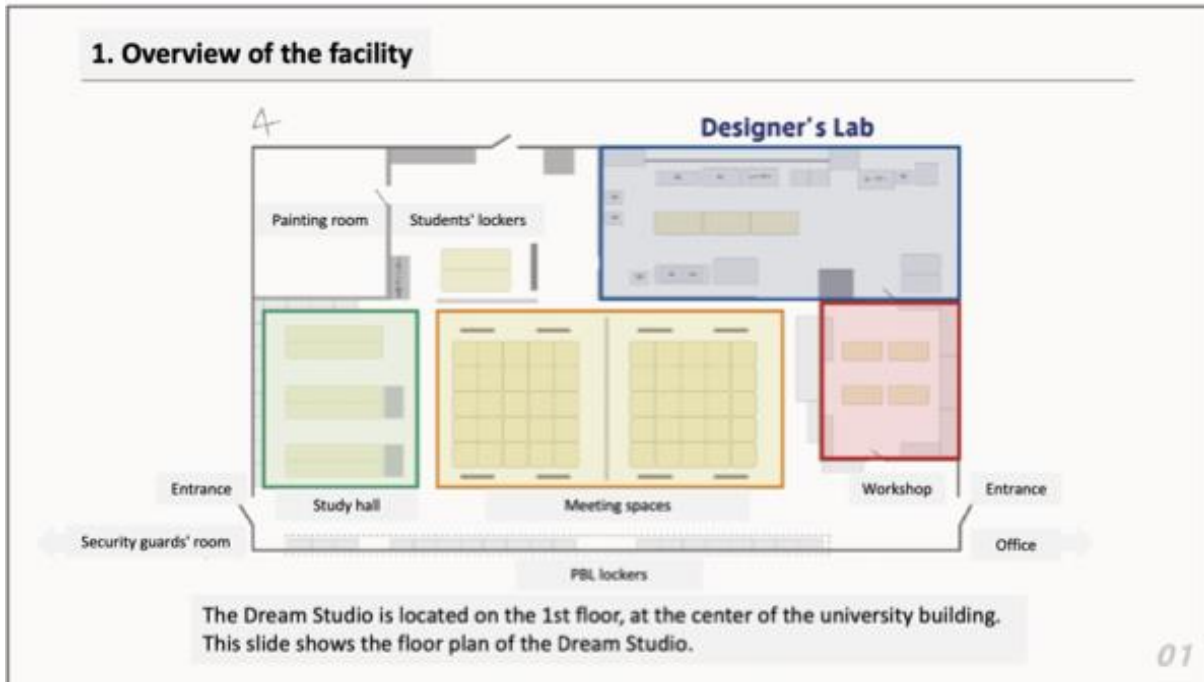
Part of the digital footage providing a tour of the facility (floor plan of the facility)
